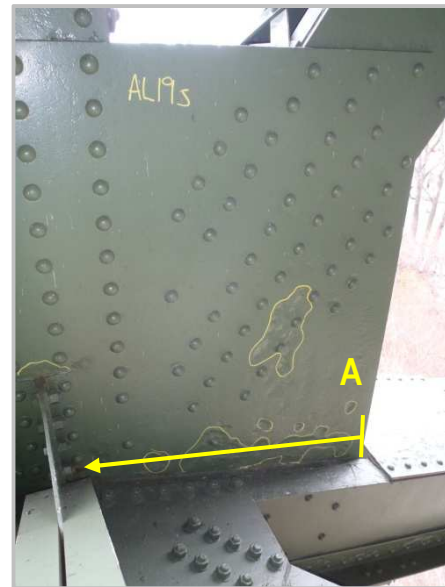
Advanced section loss along horizontal global shear plane of gusset plate AL19S (Photo taken in 2010).
